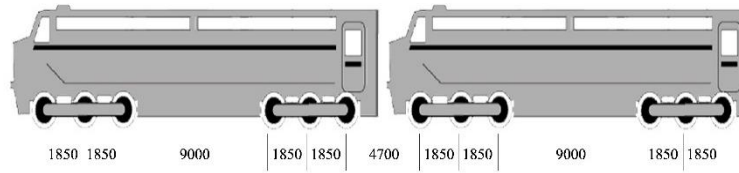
Configuration of two locomotives were used to excite Imbaba Railway Bridge.
